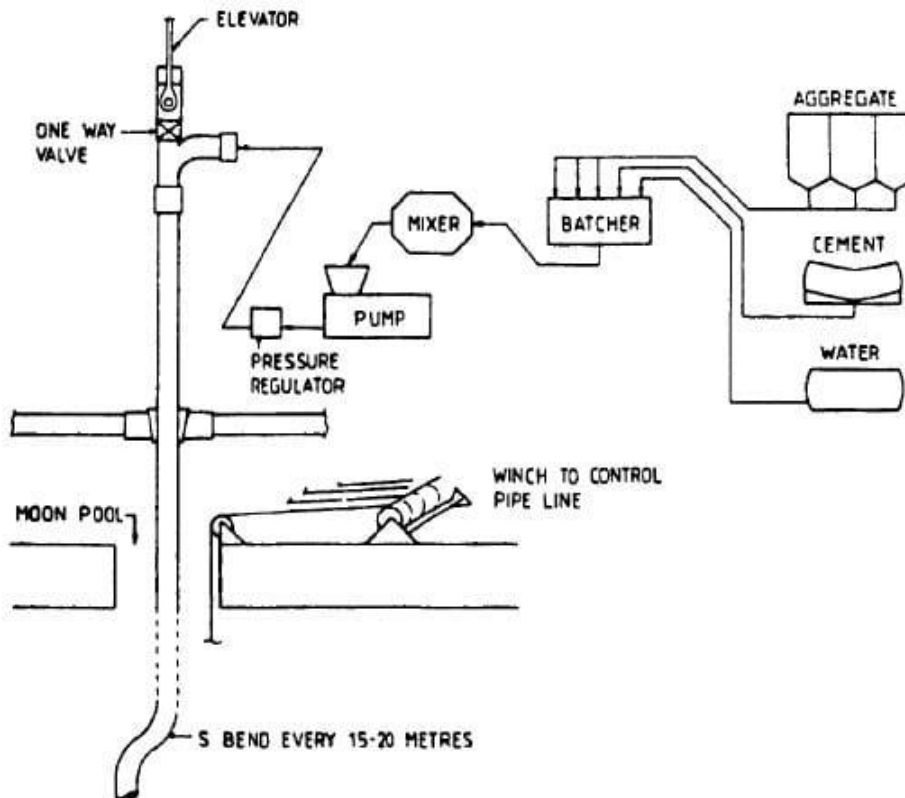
Typical Configuration of Underwater Concreting Pump Line
